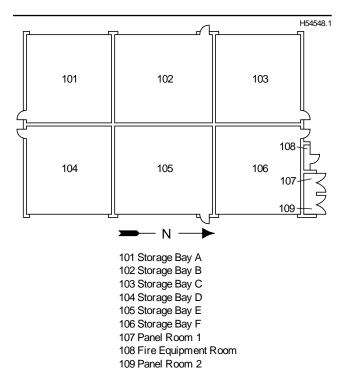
Building 3 Detailed Floor Plan, Astrotech
